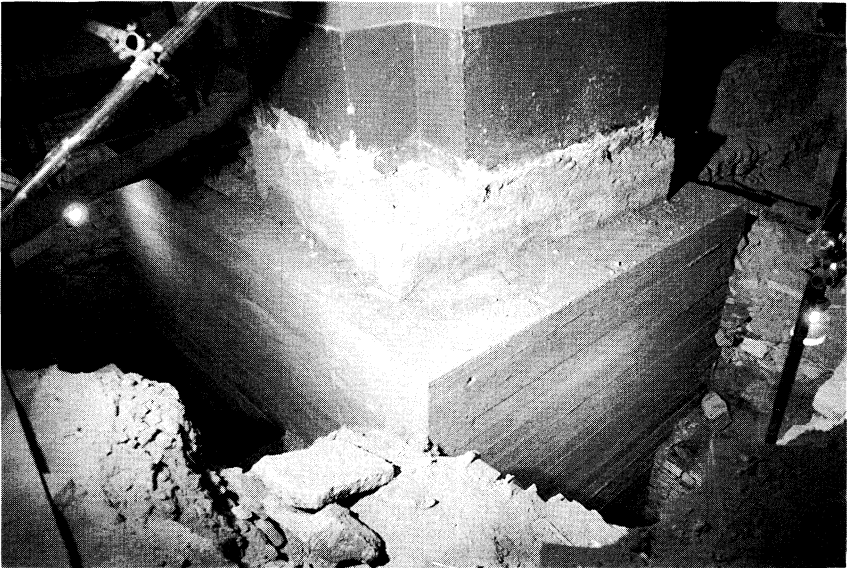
Foudation of pillar with a reinforced concrete wall.
